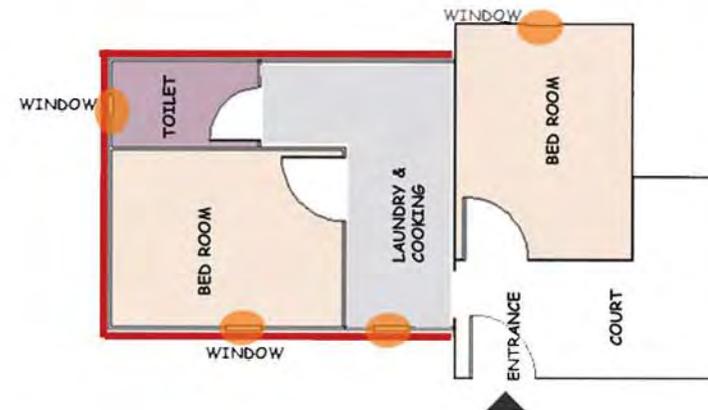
,9 WINDOWS ARE ORIENTED TO THE NORTH WEST (PREVAILING WIND) OR EAST (SEA BREEZE)
